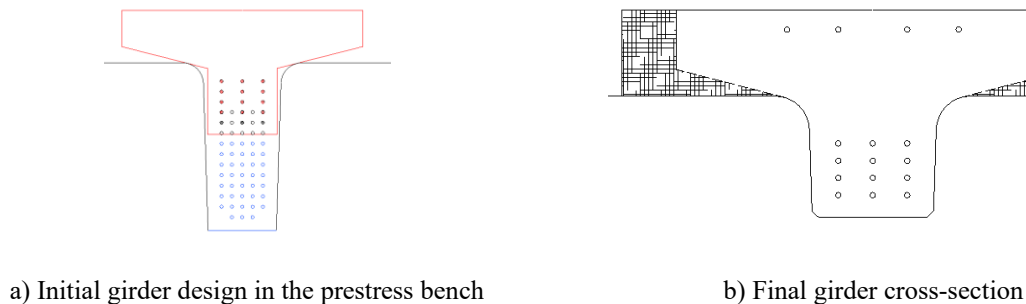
Sketch of the cross section of the formwork used at BPDL
